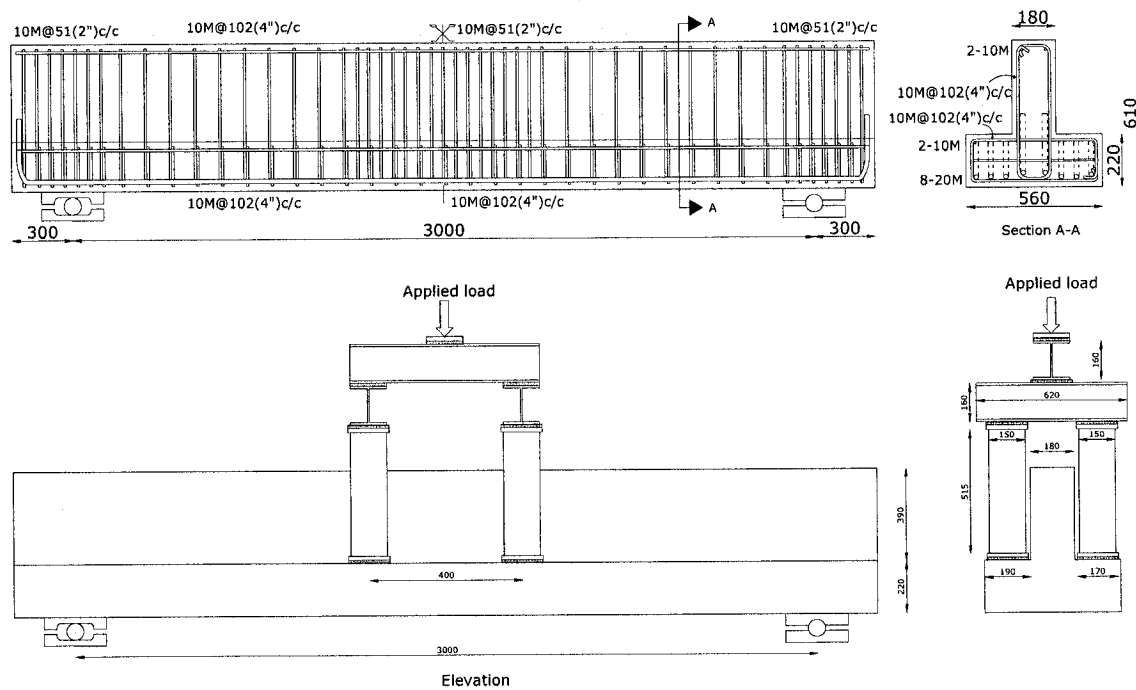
Dimensions, details of reinforcement and test profile for girder IT-G4
